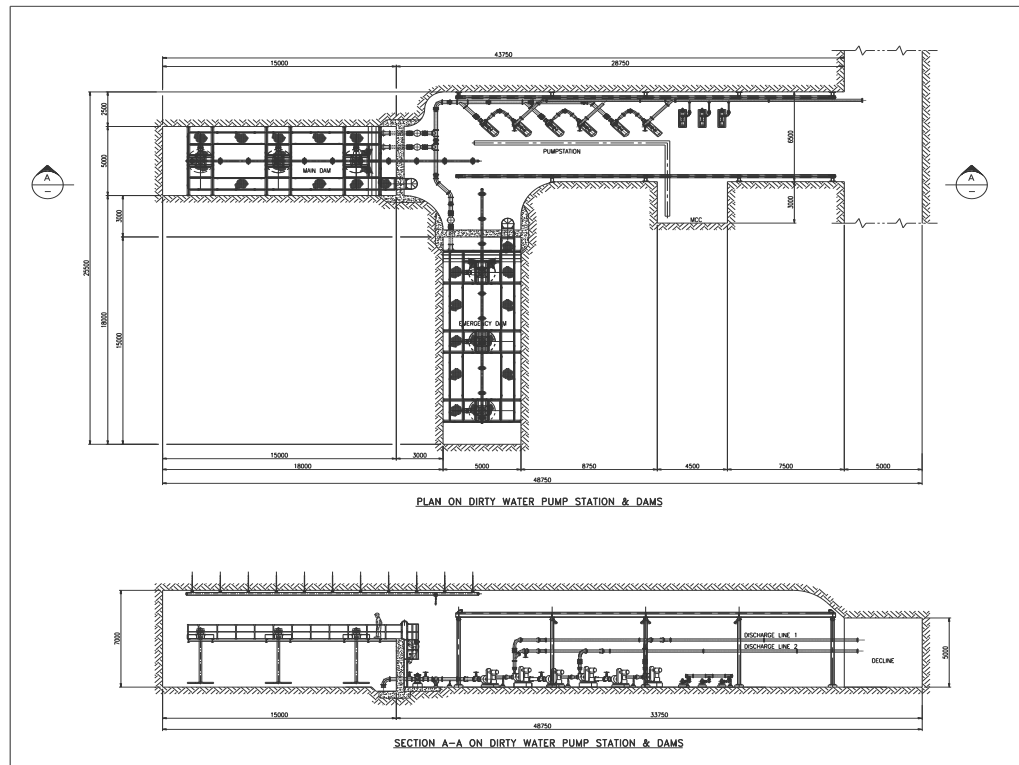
GENERAL ARRANGEMENT FOR PUMP STATION
